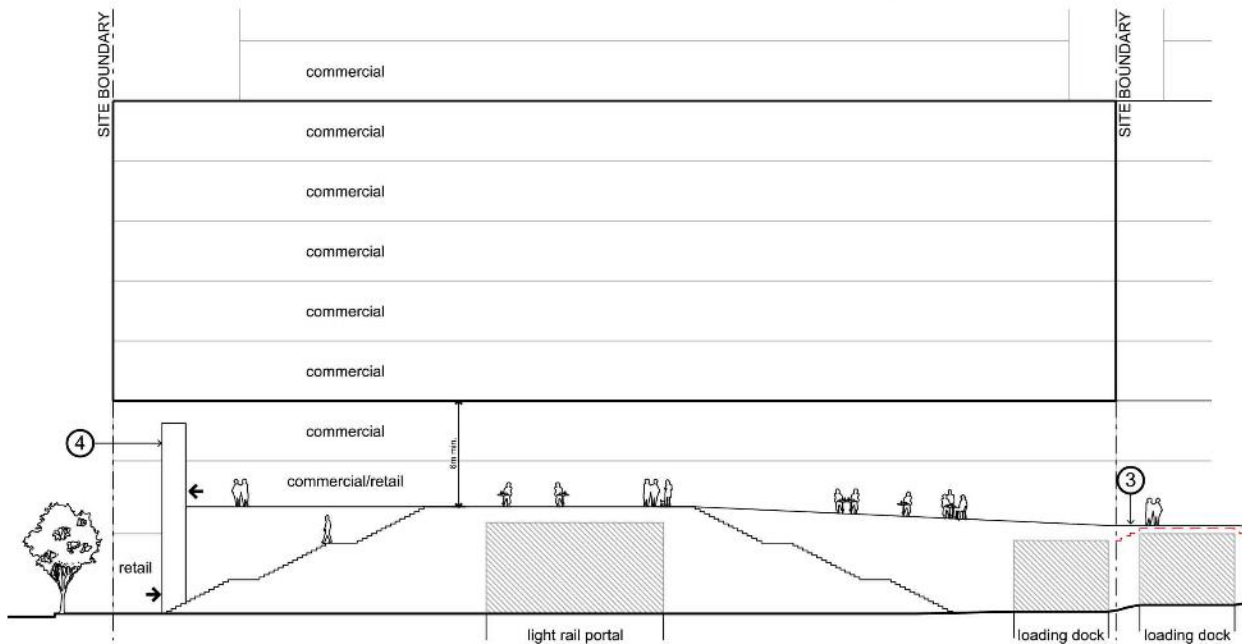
Elevation showing Edward Street light rail crossing at 60 Union Street – interim and future integration with 60 Union Street
